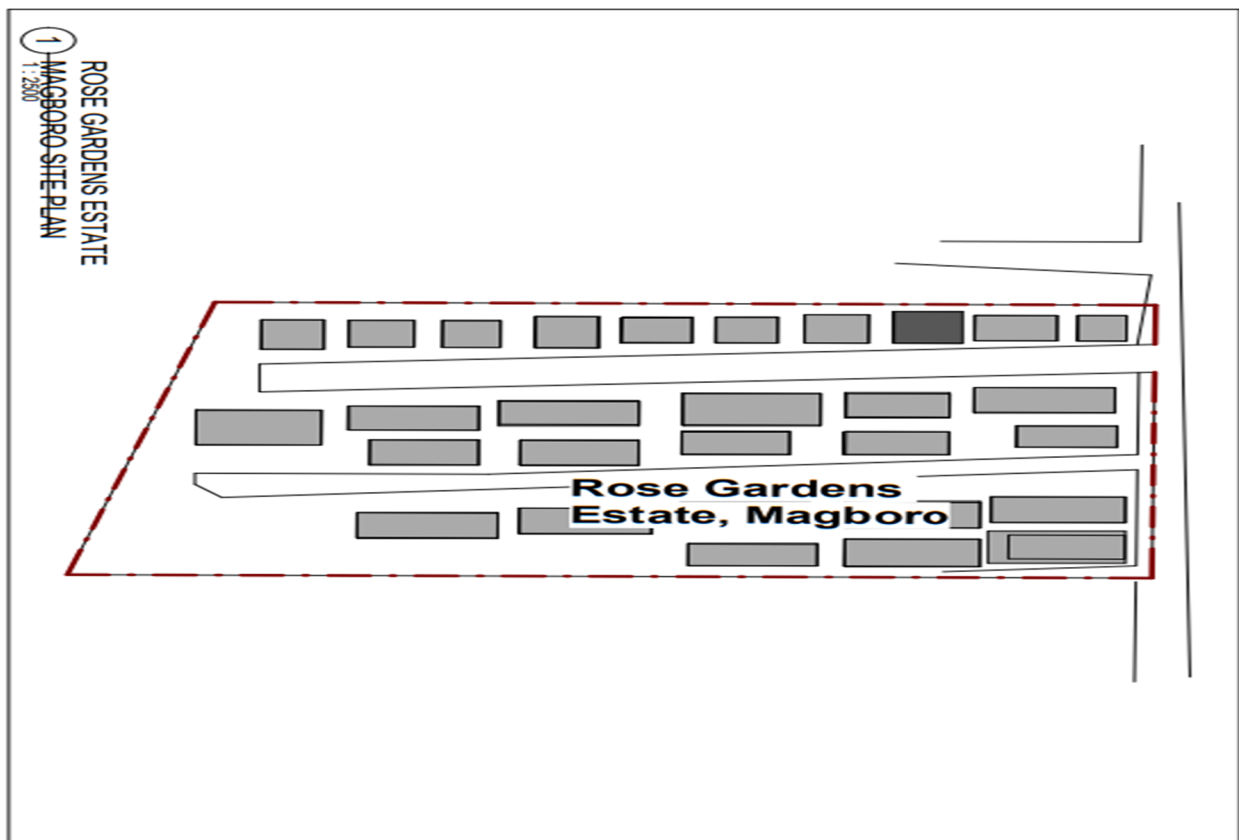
SITE PLAN OF CASESTUDY ONE
